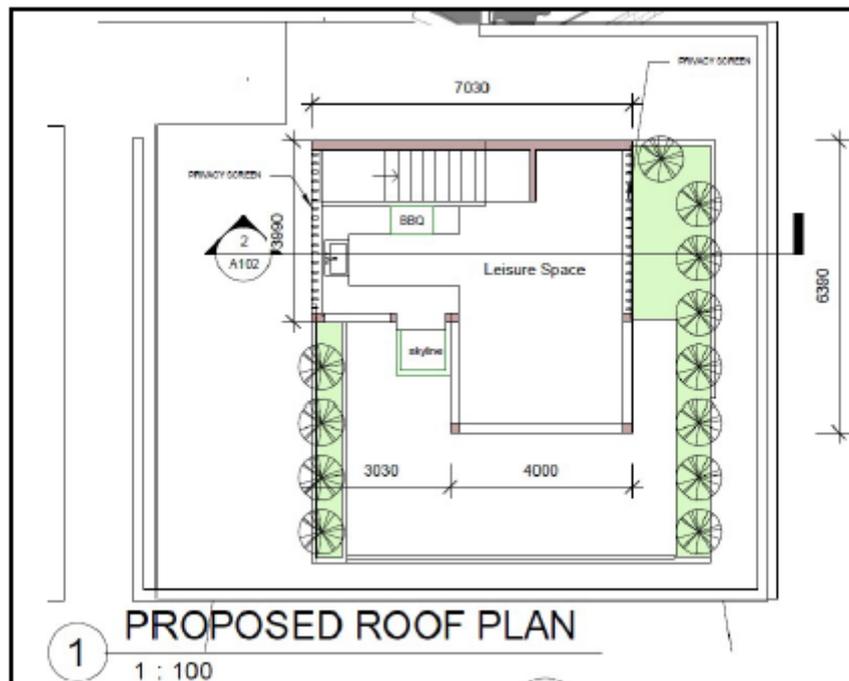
Excerpt Roof Plan illustrating recessed awning structure
